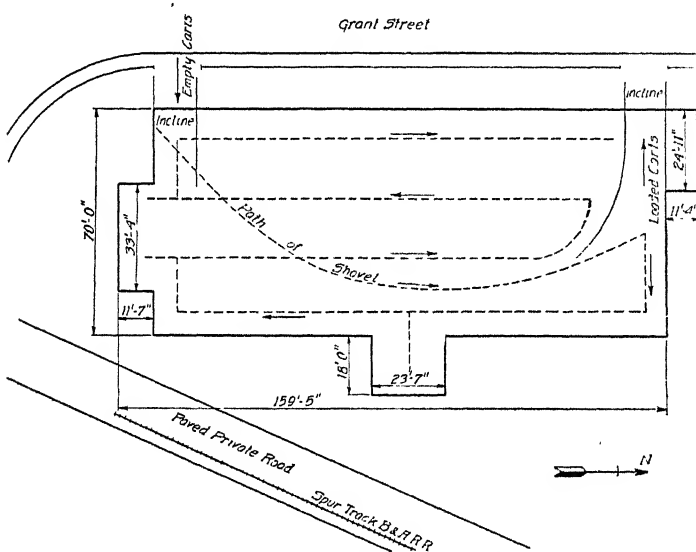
Excavation Diagram for Reinforced-Concrete Building Showing Location and Path of Shovel
